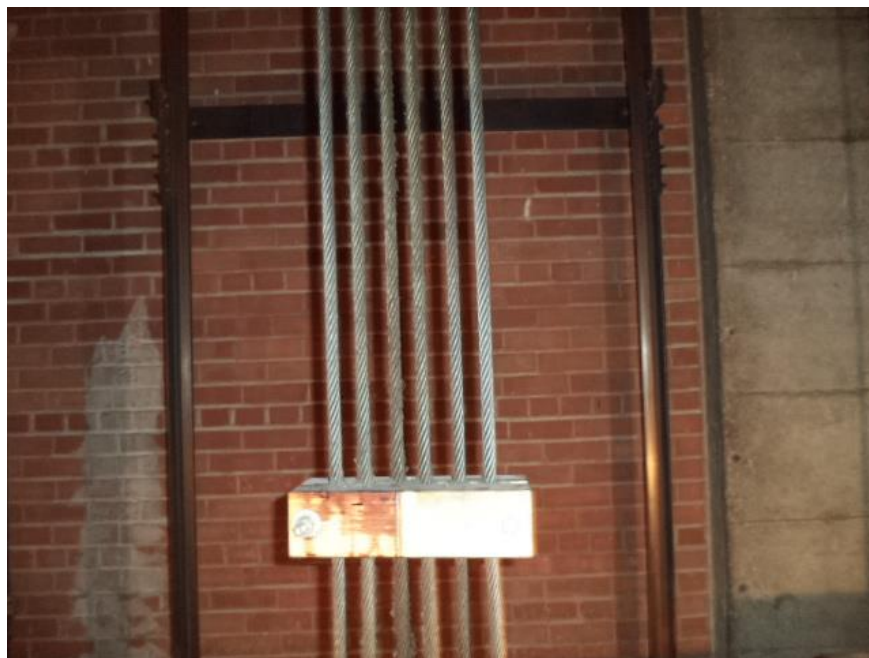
Overview of East and West walls inside elevator shaft at 25 St. Clair Ave E
